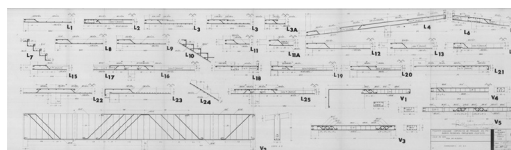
Miradouro Building: reinforced concrete elements (CMPorto et al., 1964).
